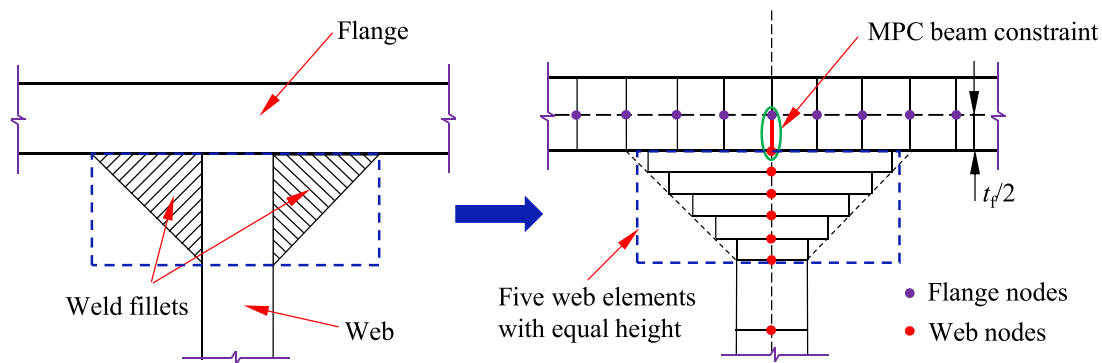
Modelling technique for geometrical representation of weld fillets in welded I-sections.
